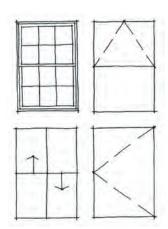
Vertical windows (examples above) will normally have vertical sub-division. Vertically-sliding sashes will be used in vernacular buildings, whilst other opening systems may be employed with contemporary architecture. Horizontal windows (examples below) will follow similar rules. Top hung false sash windows are not allowed.
